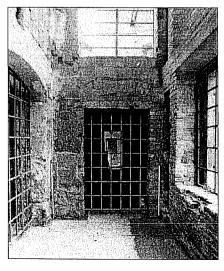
Scullery north wall showing early masonry (Archive - Photo 112)
